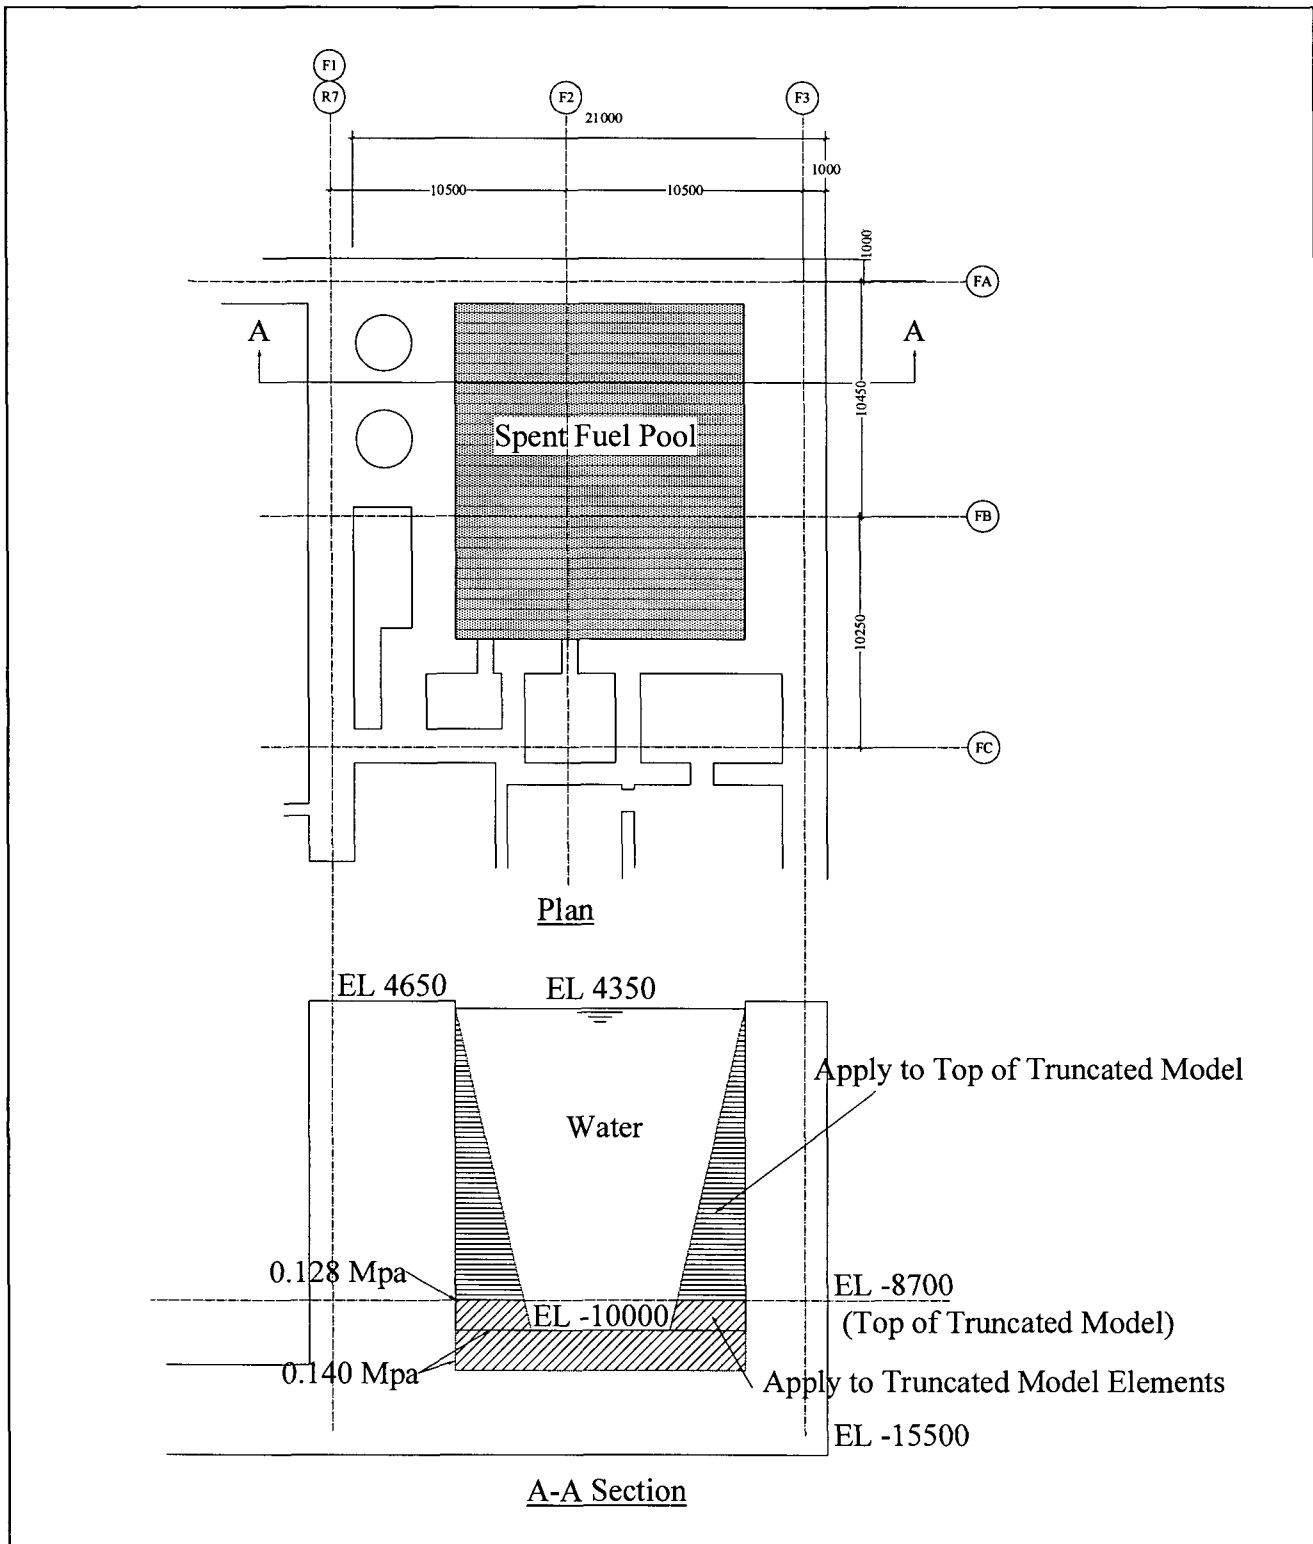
Hydrostatic Load Applied to the Spent Fuel Pool Walls and the Basemat
